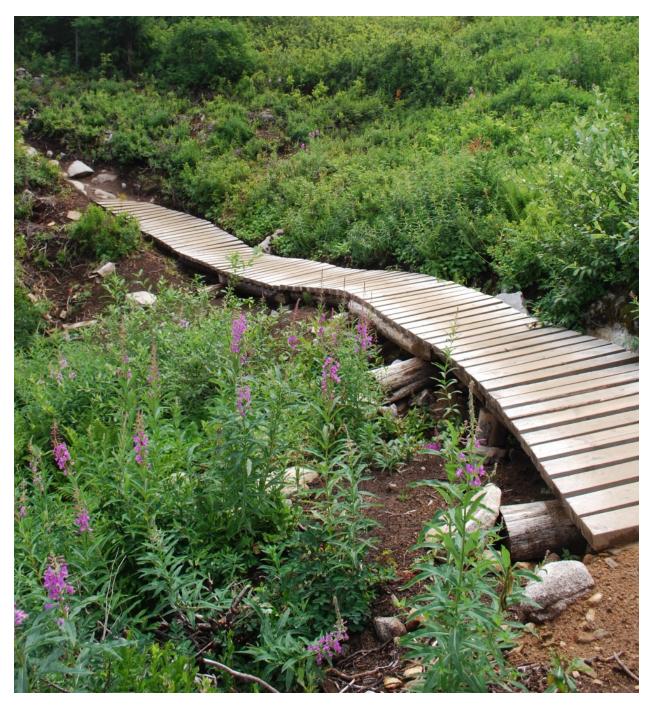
Skills Park 2 Example Elevated Wood Feature
